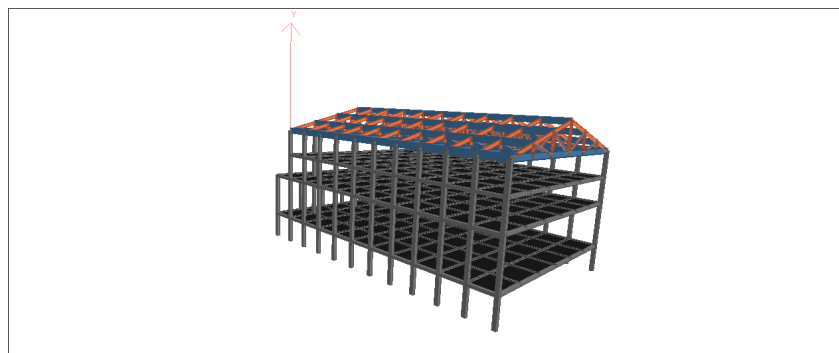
D Rendered View –AUDITORIUM BUILDING
